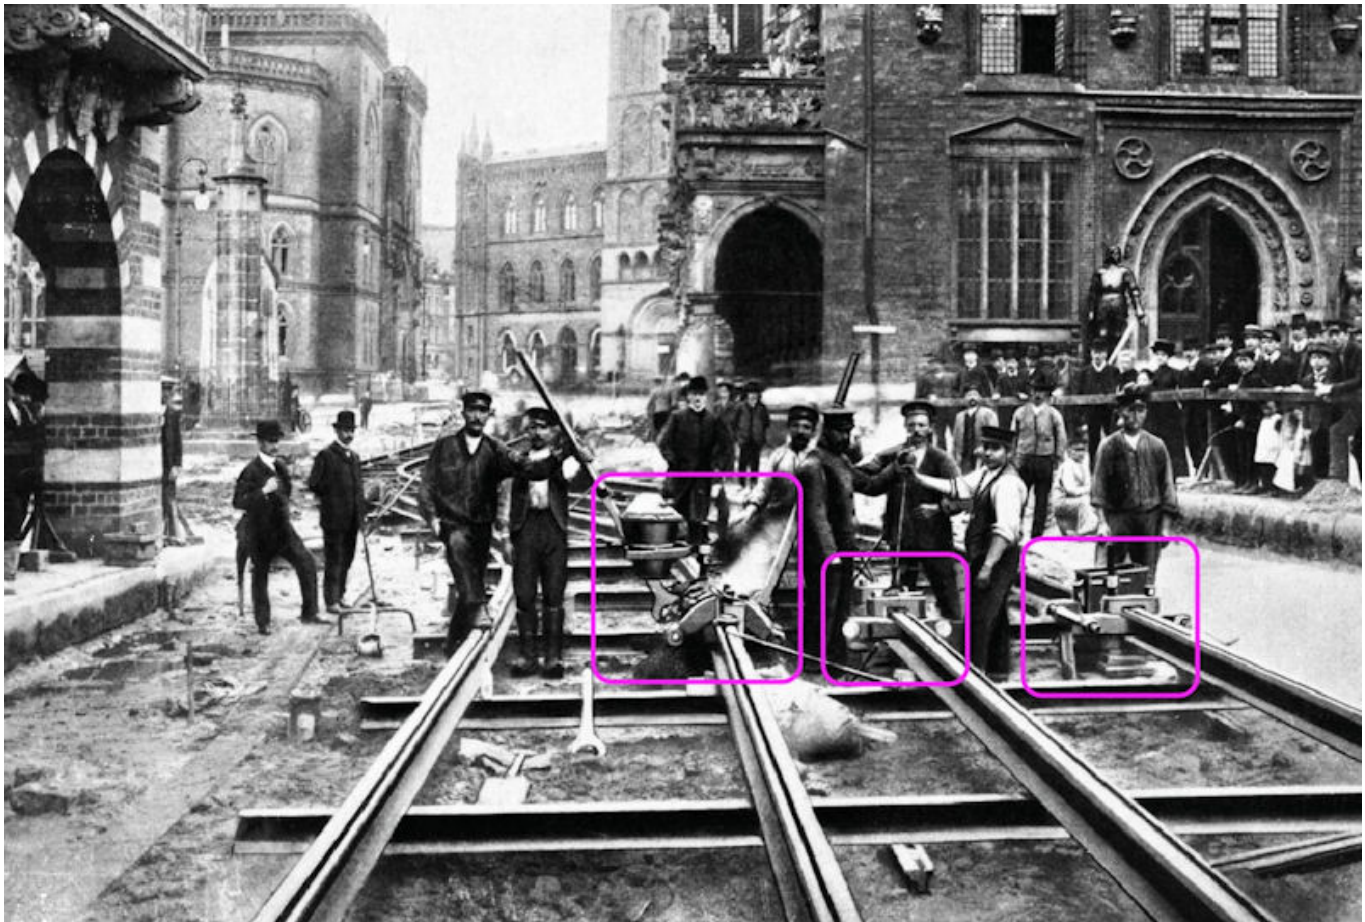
Thermit-welding of tramway tracks in the city center of Bremen/Germany around 1900
